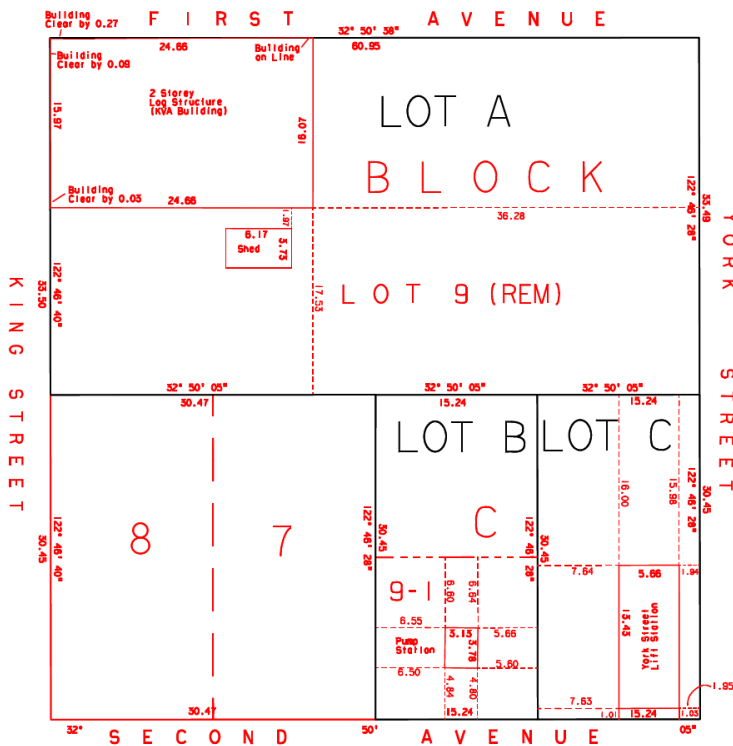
Proposed lot configuration, including existing buildings. Note: 9-1 Pump Station since demolished.
